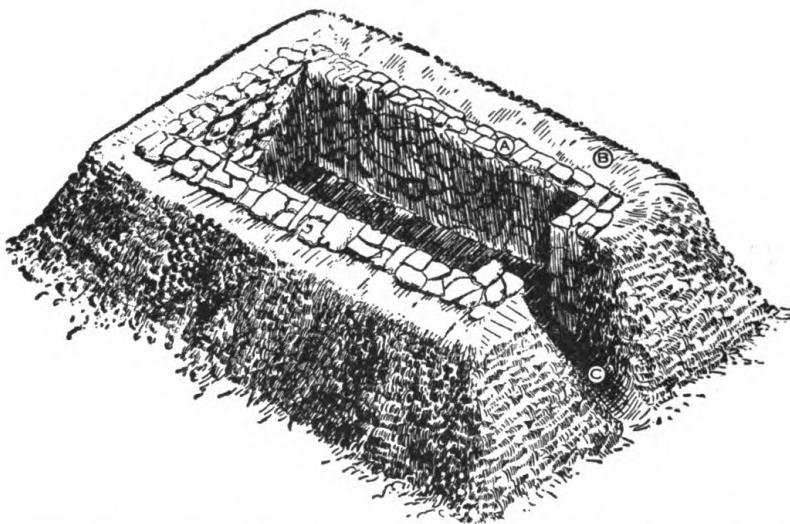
Rock pit incinerator (schematic). A—Rock wall. B—Earthen embankment to support rock walls. C—Open end to permit draft.
